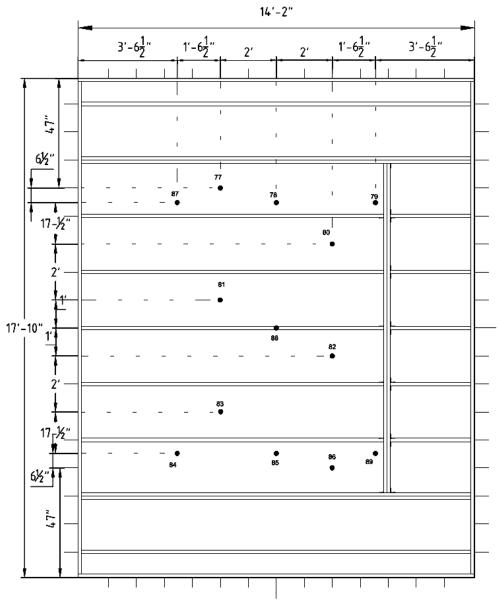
Thermocouple Locations on Unexposed Surface.
